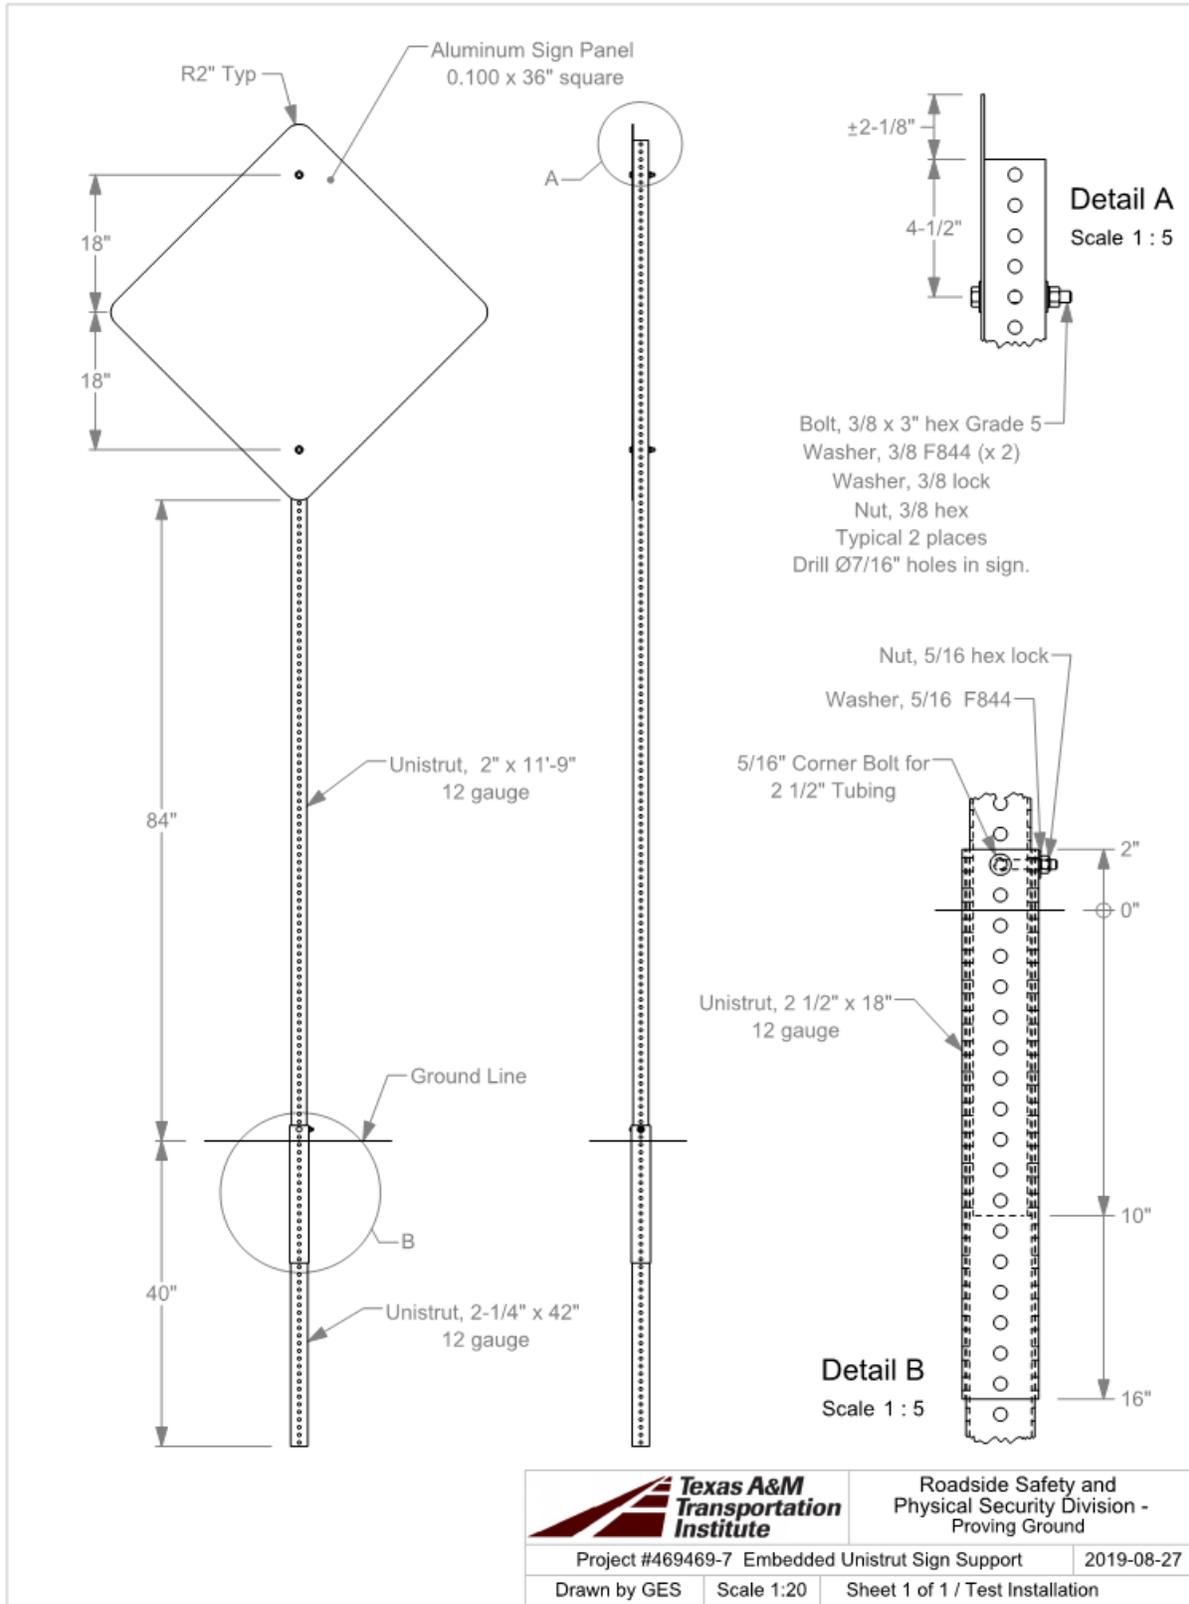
Overall Details of the PSST Sign Support in Anchor Stub System for Test No. 469469-7-5.
